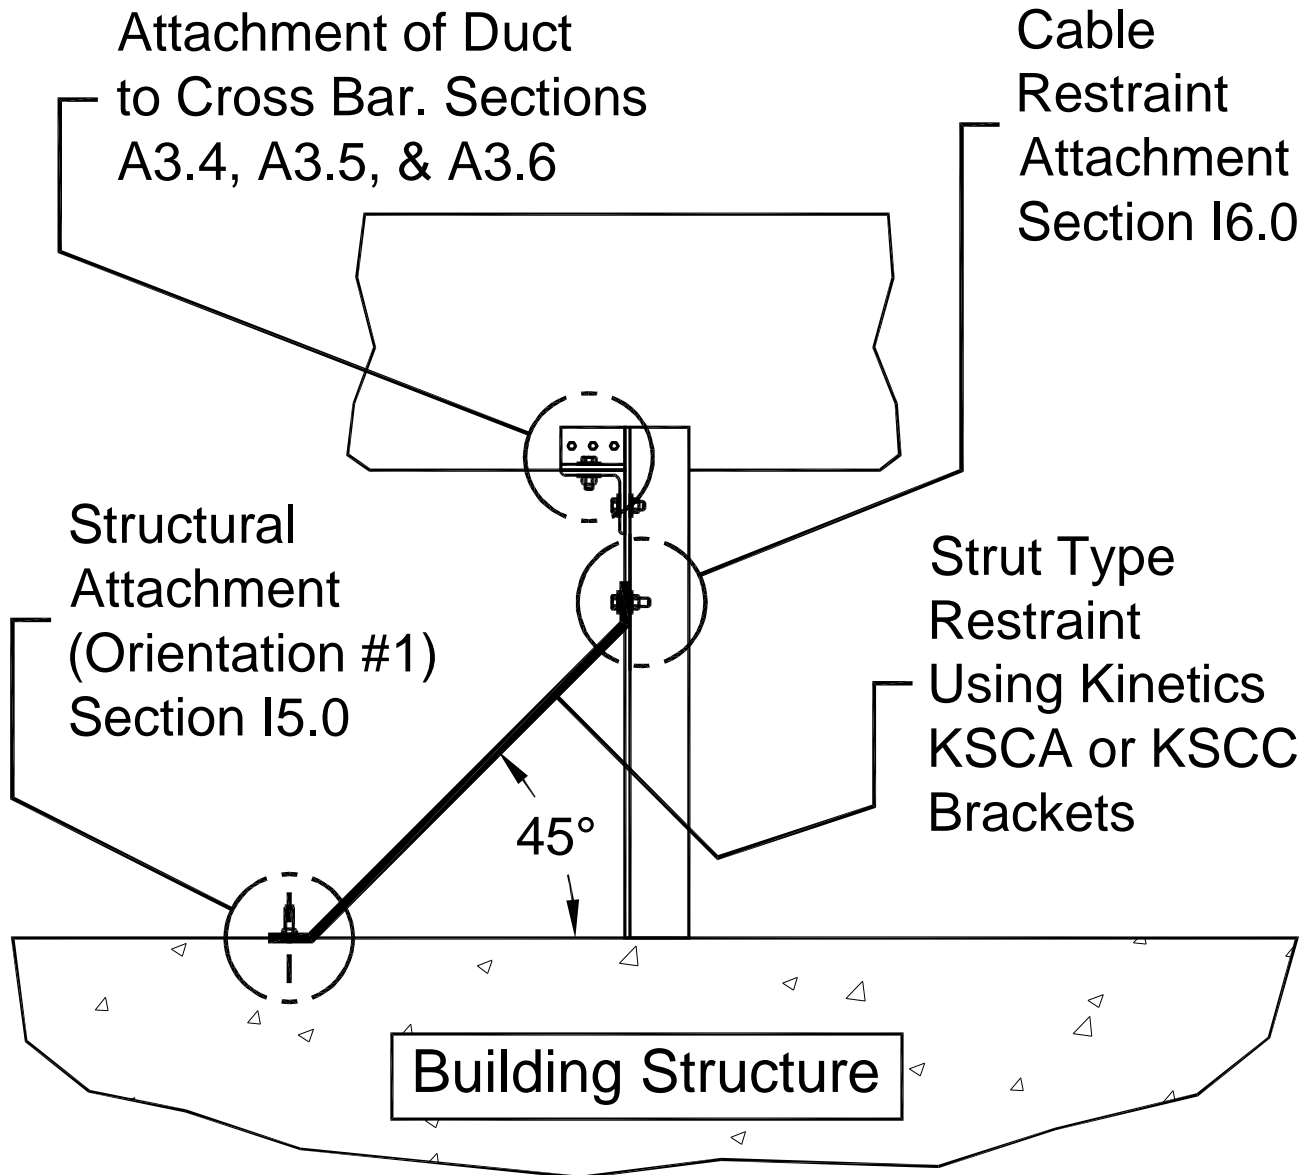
; Longitudinal (L) Strut Type Restraint Schematic for Floor/Roof Mounted Duct – Strut Attached to the Floor Stand or Support at a 45° Angle
